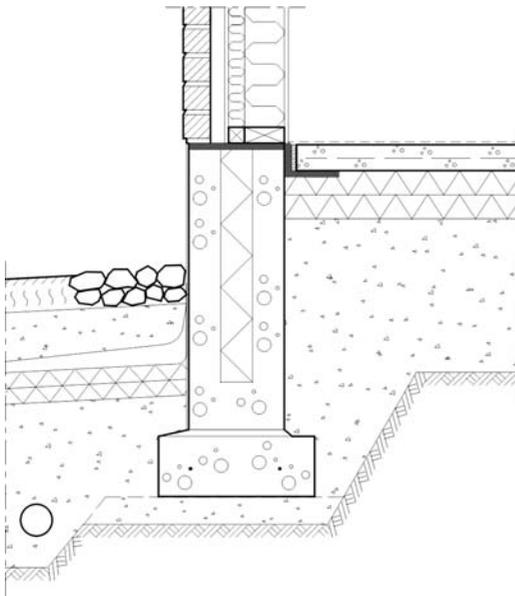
Sealing of the gap between the foundation wall and floor slab according to the Finnish guidelines.
